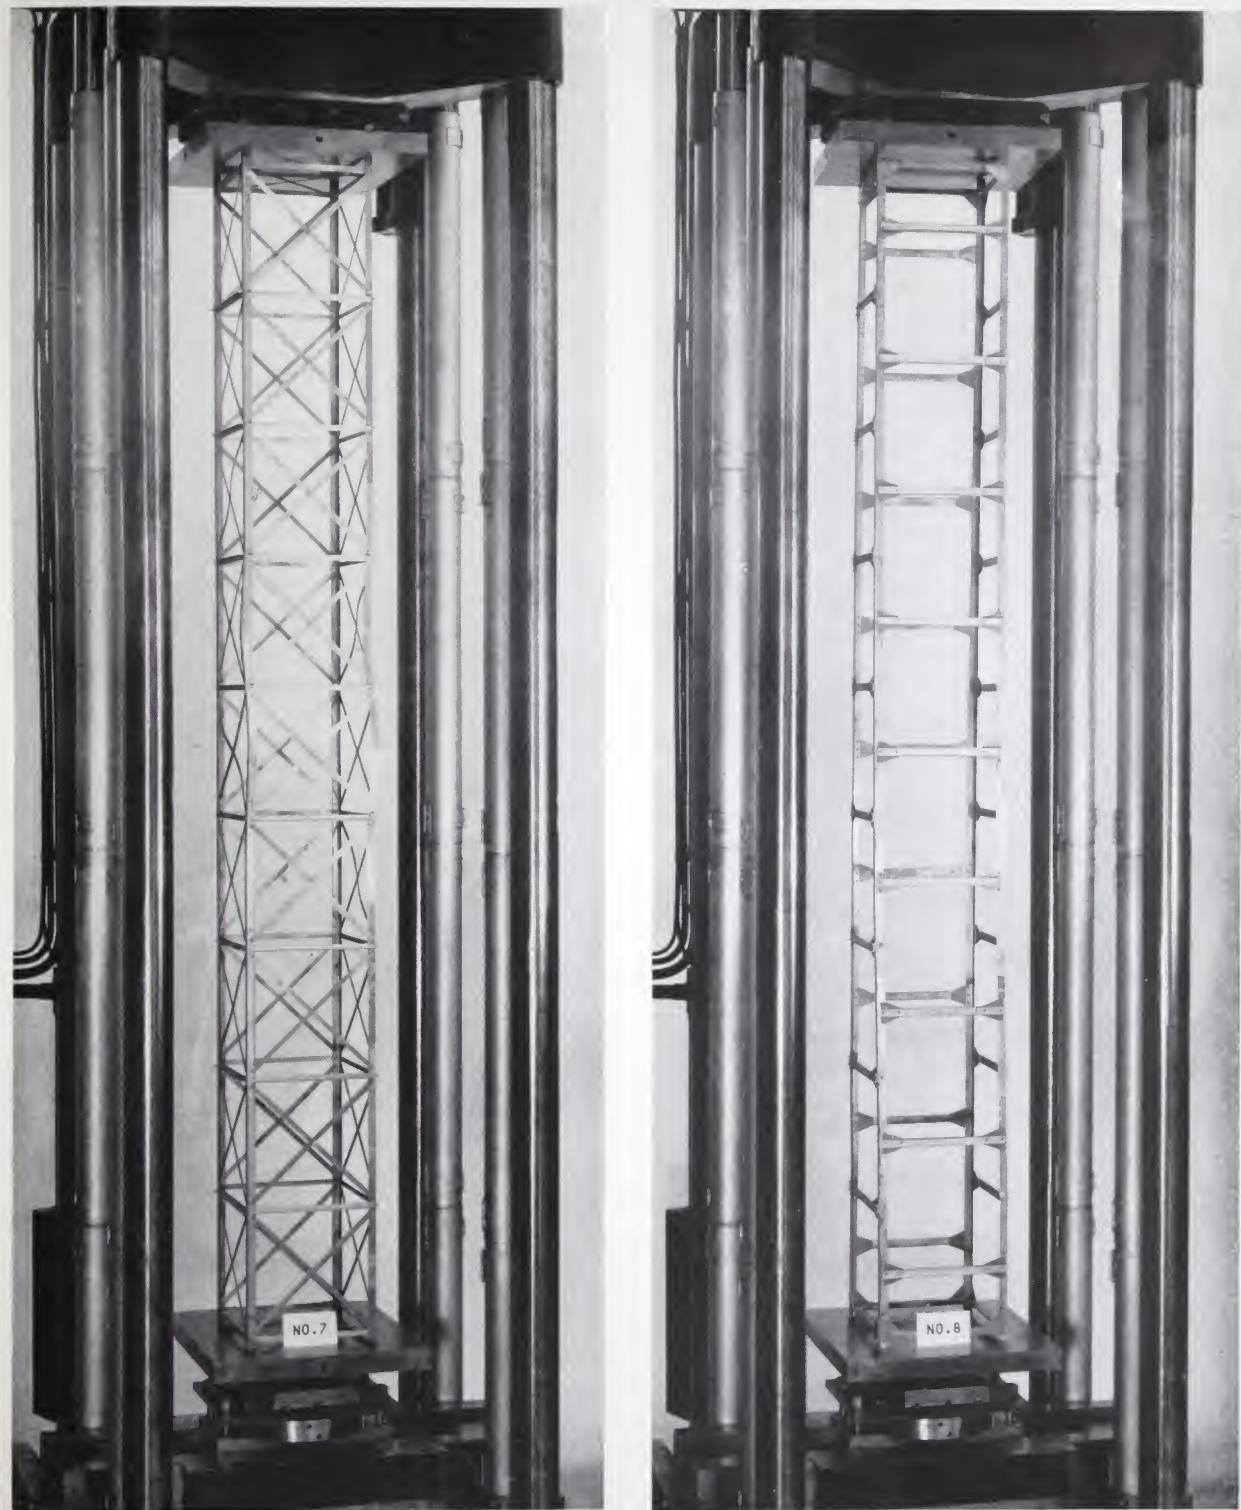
FRAMES NO. 7 AND 8 AFTER FAILURE IN COMPRESSION TEST.
